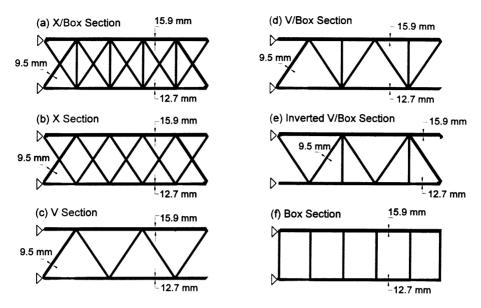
Shapes considered for design of a truss-type composite bridge deck. (a) X/box section; (b) X section; (c) V section; (d) V/box section; (e) inverted V/box section; (f) box section.
